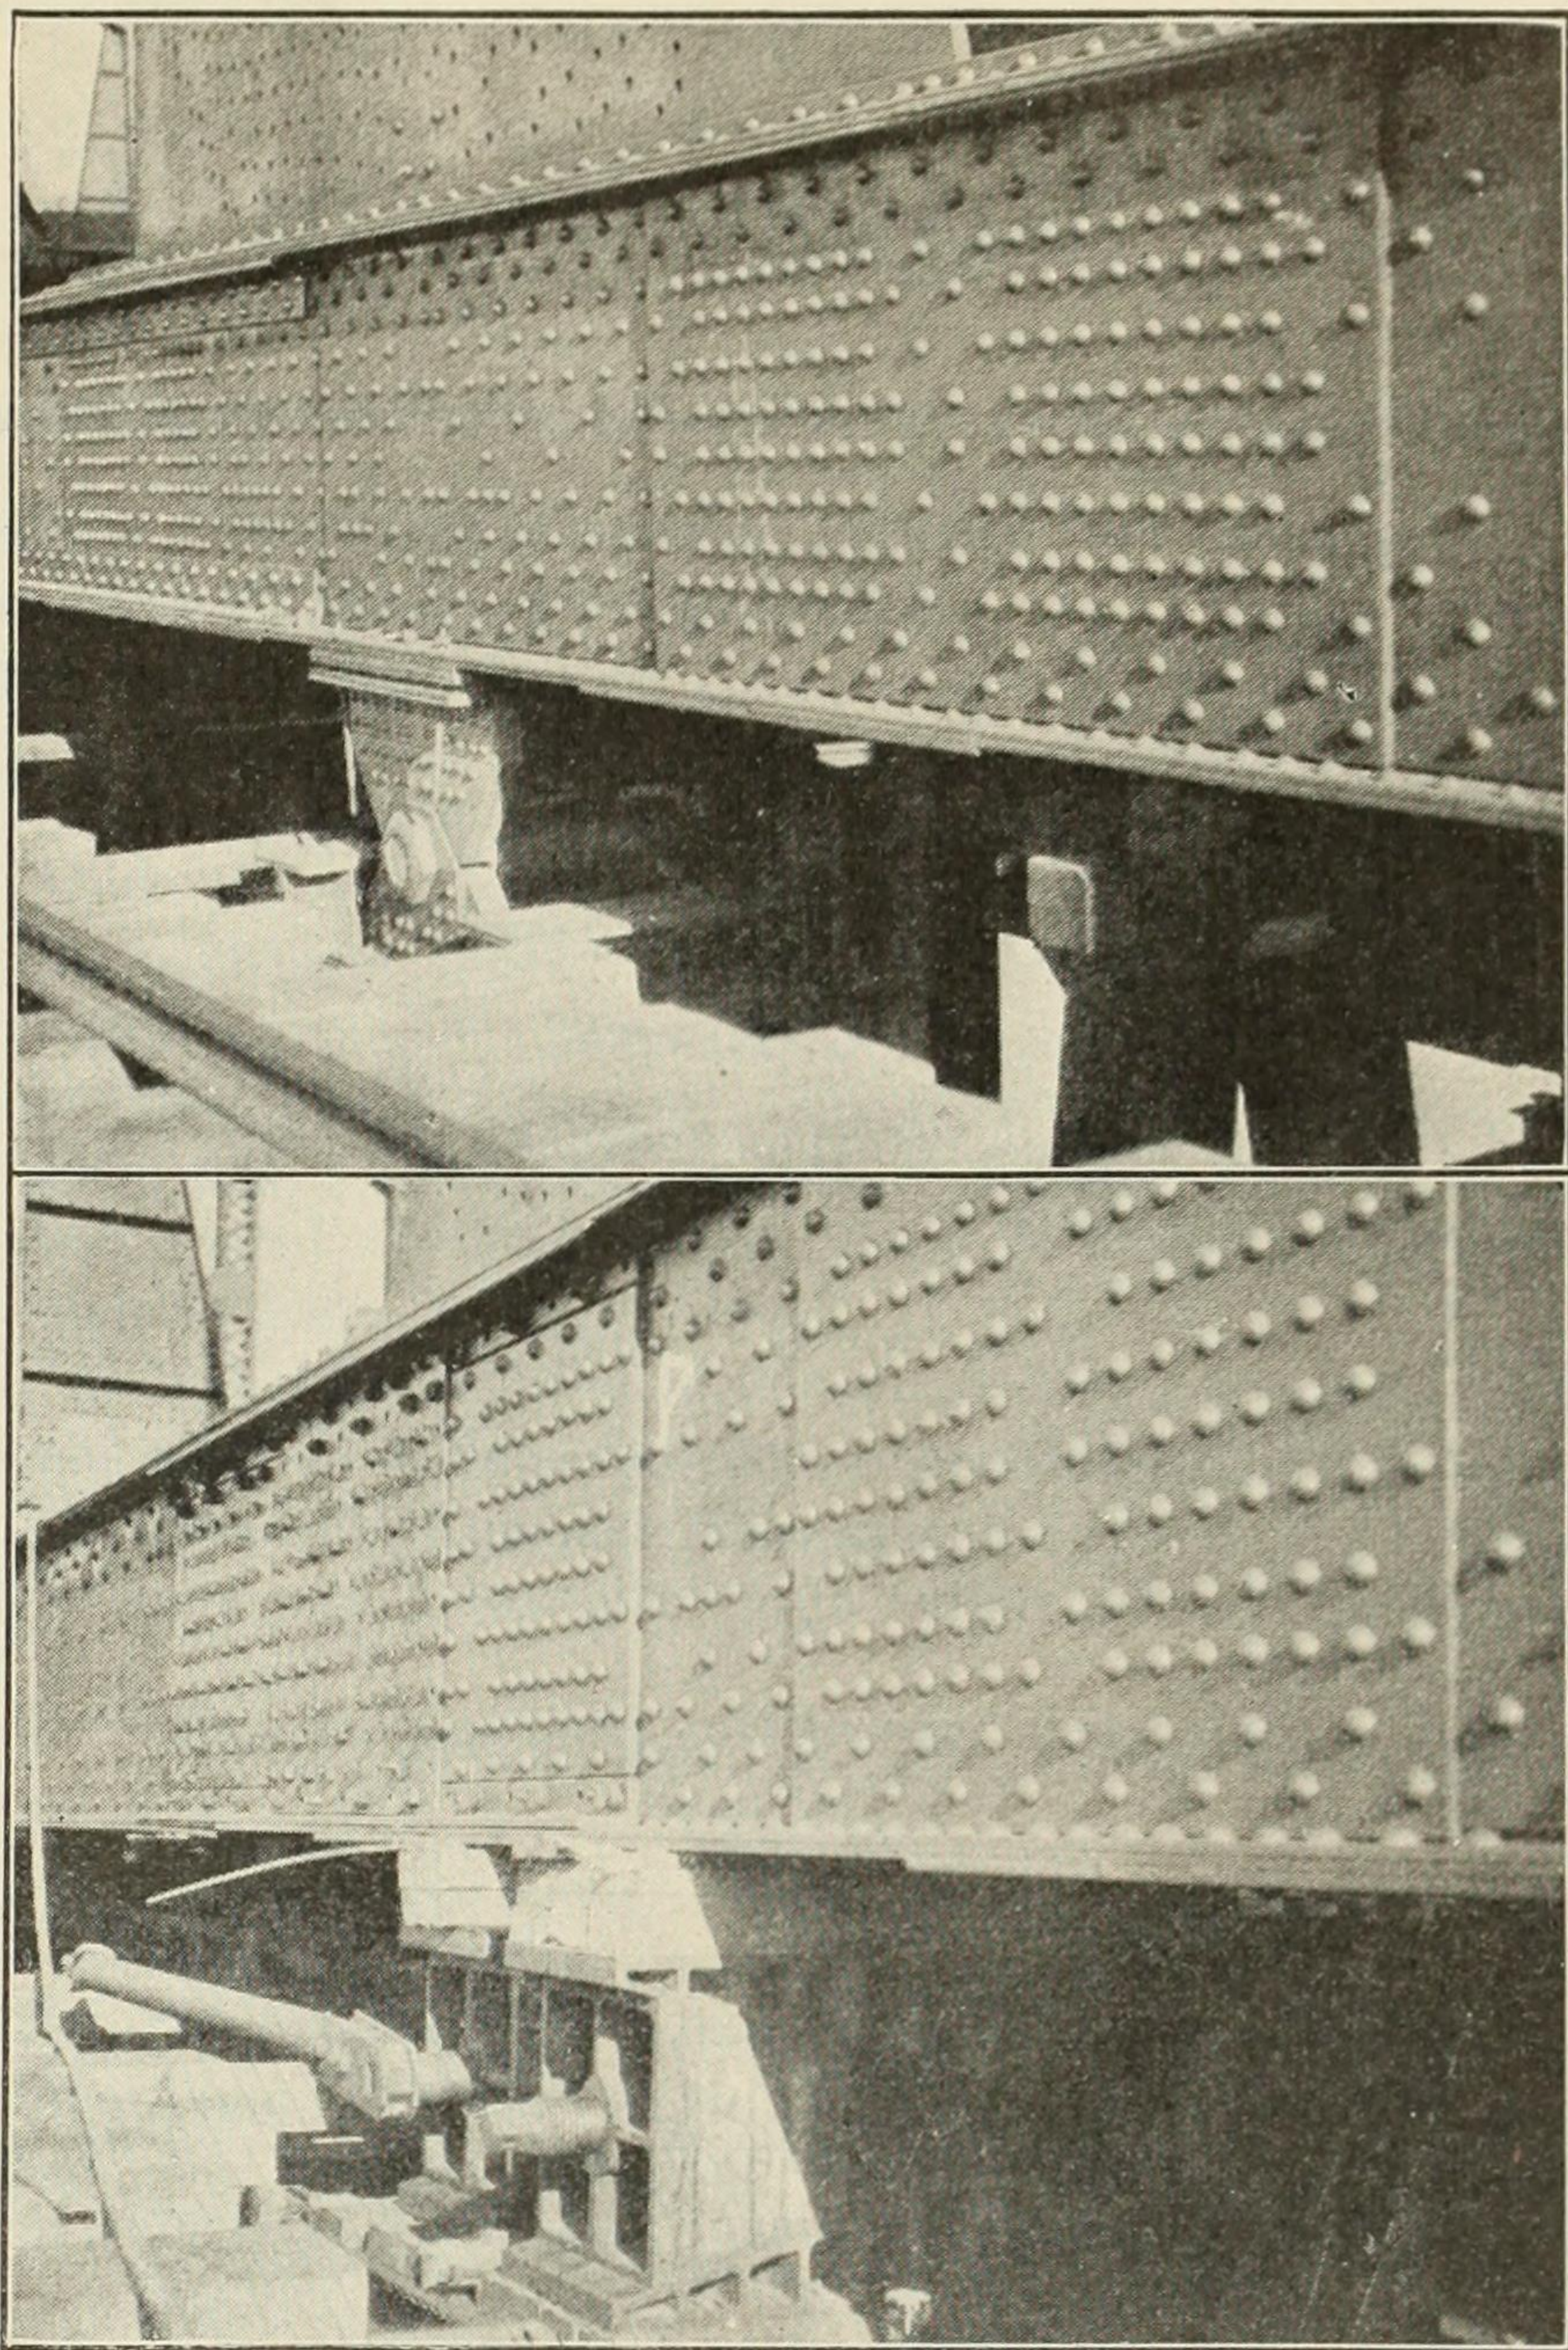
THE U-FLOOR BEAMS SEEN FROM THE CENTER PIER; GUSSETS OF L 20 AT LEFT
